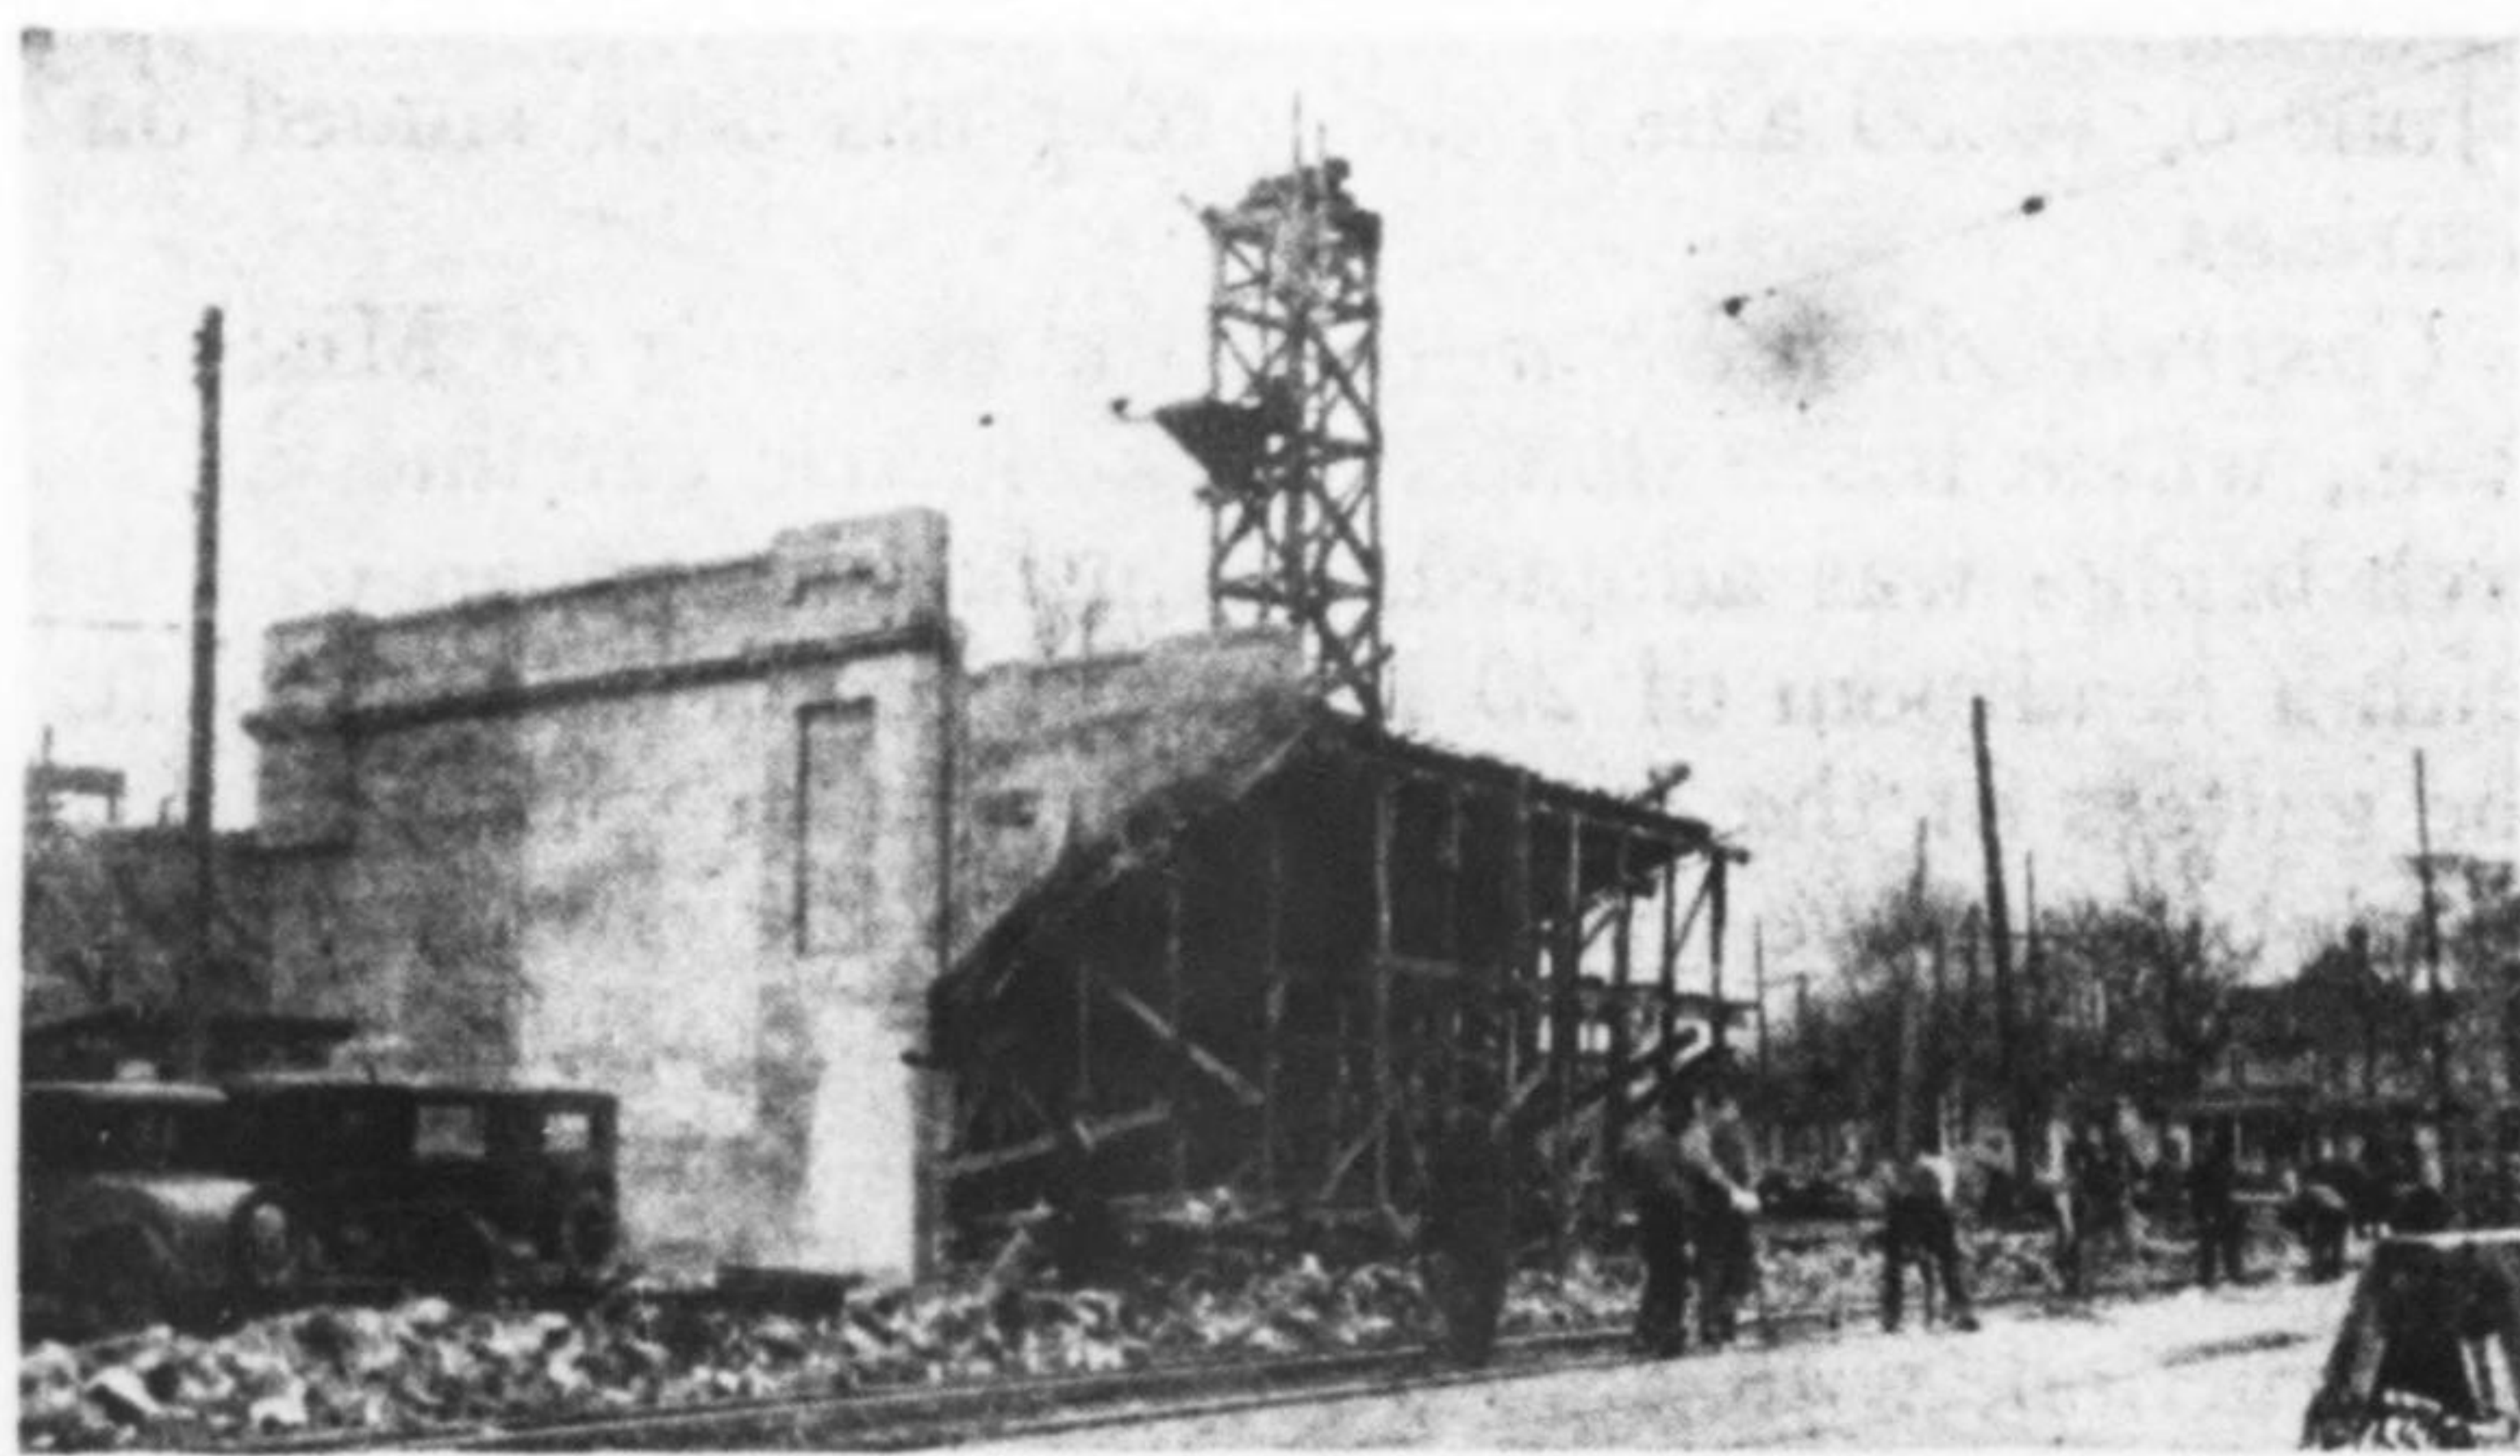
CONSTRUCTION OF ARCH BRIDGE
